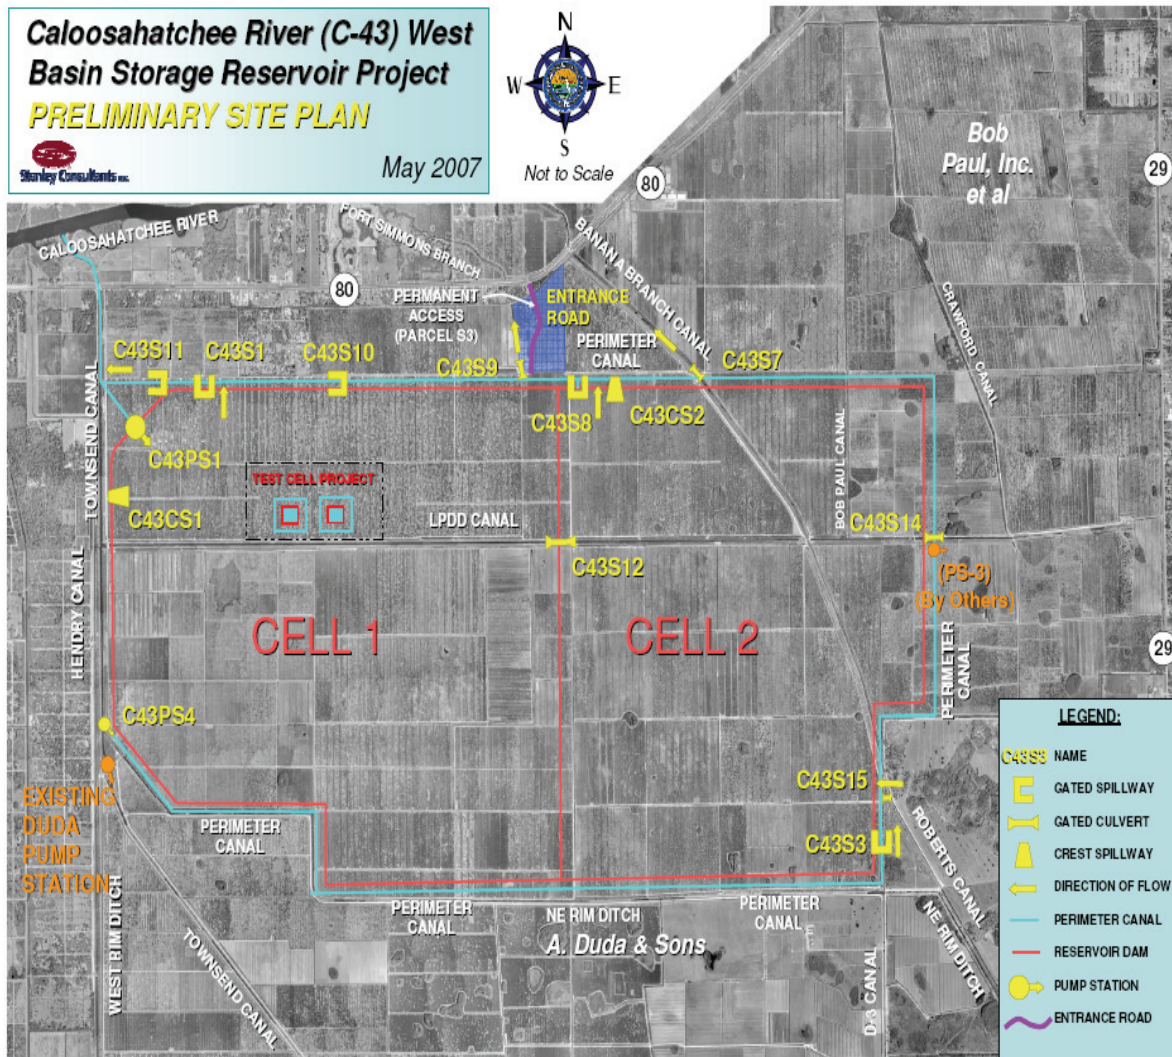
SELECTED ALTERNATIVE PLAN FEATURES
